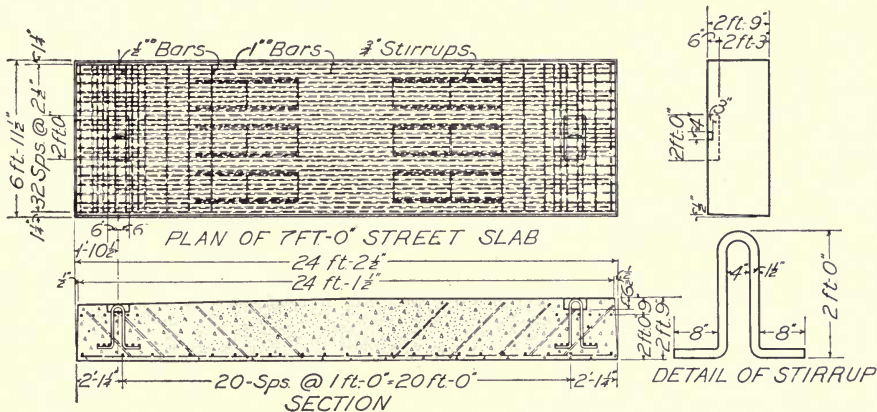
DETAILS OF TYPICAL SLAB, C., B. & Q. R. R. TRACK ELEVATION.
